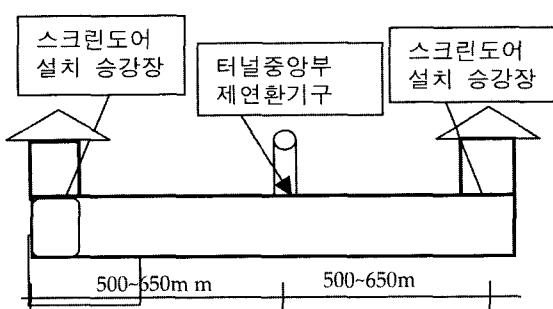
Longitudinal section of a subway tunnel(exiting standard)
